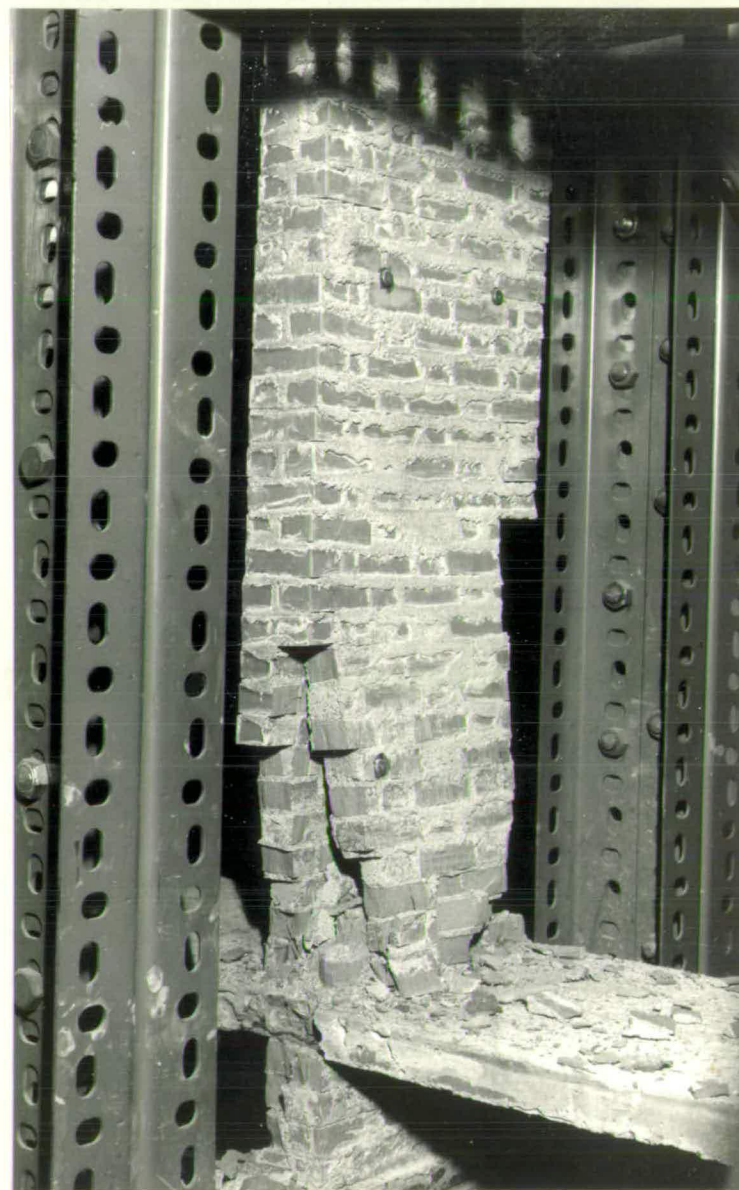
Typical failure by splitting in the thickness of wall (Flemish bond)
